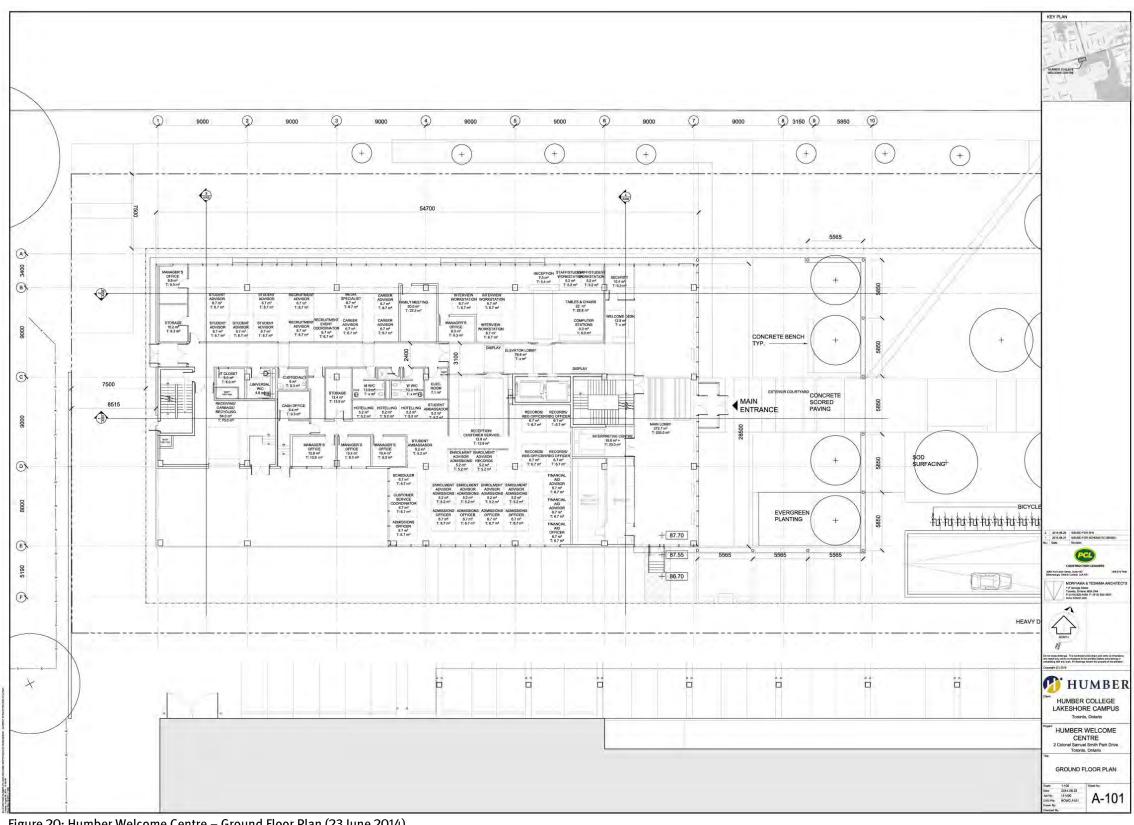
Humber Welcome Centre – Ground Floor Plan (23 June 2014)
